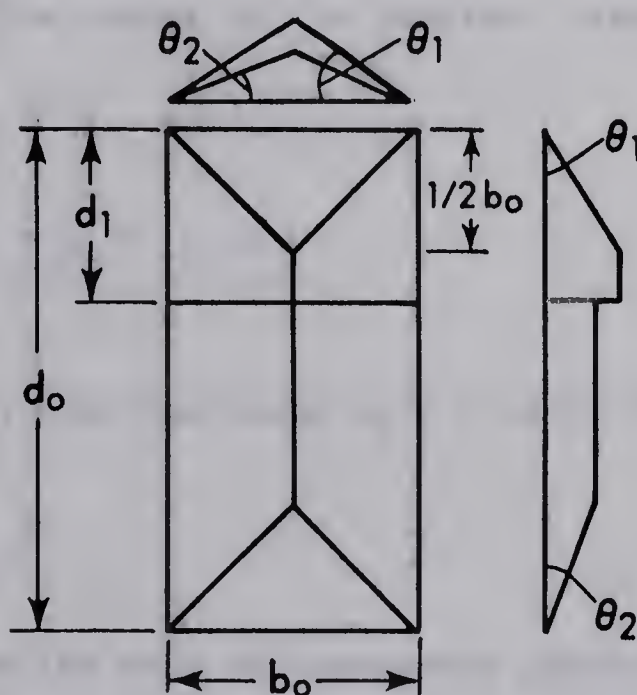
CROSS-SECTIONAL DIMENSIONS
